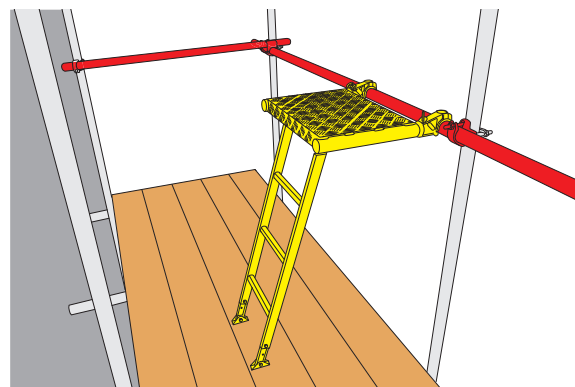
Example of a scaffolders' step used to install guardrails in advance.
